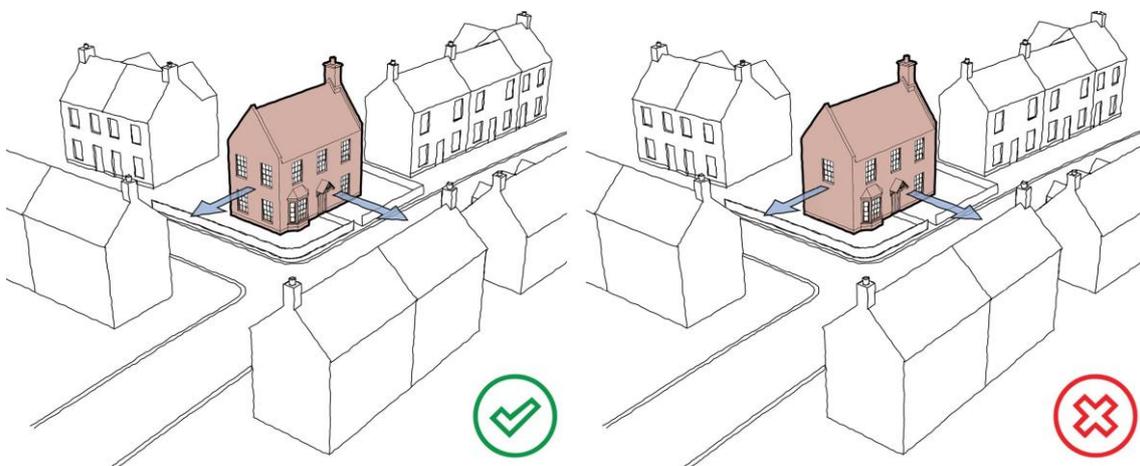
Corner homes must include at least two windows on all street-facing elevations
